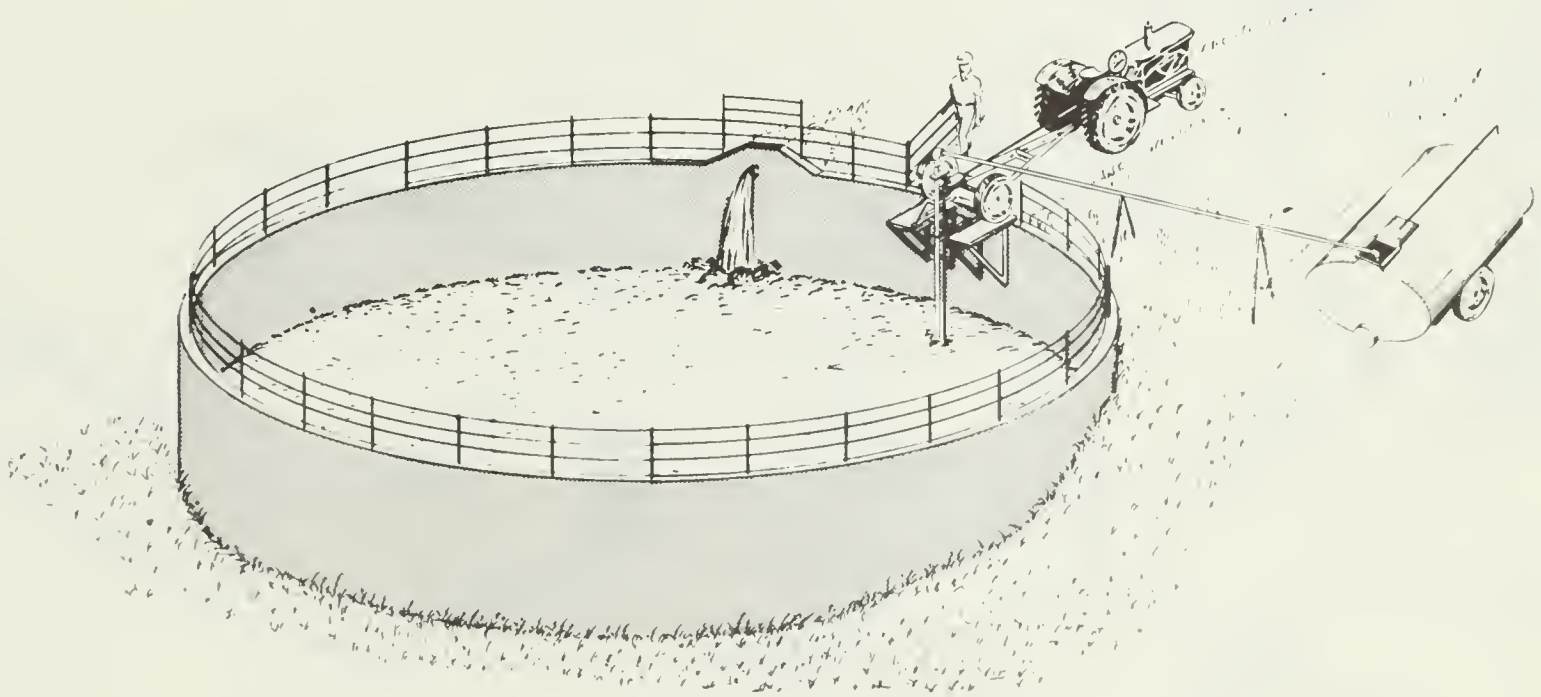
Below-ground open circular manure tank (CPS plan M-3752)
